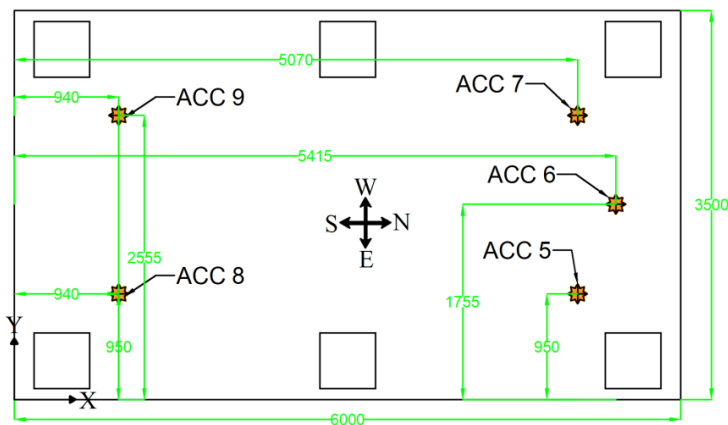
Location of accelerometers on top slab (dimensions in mm)
